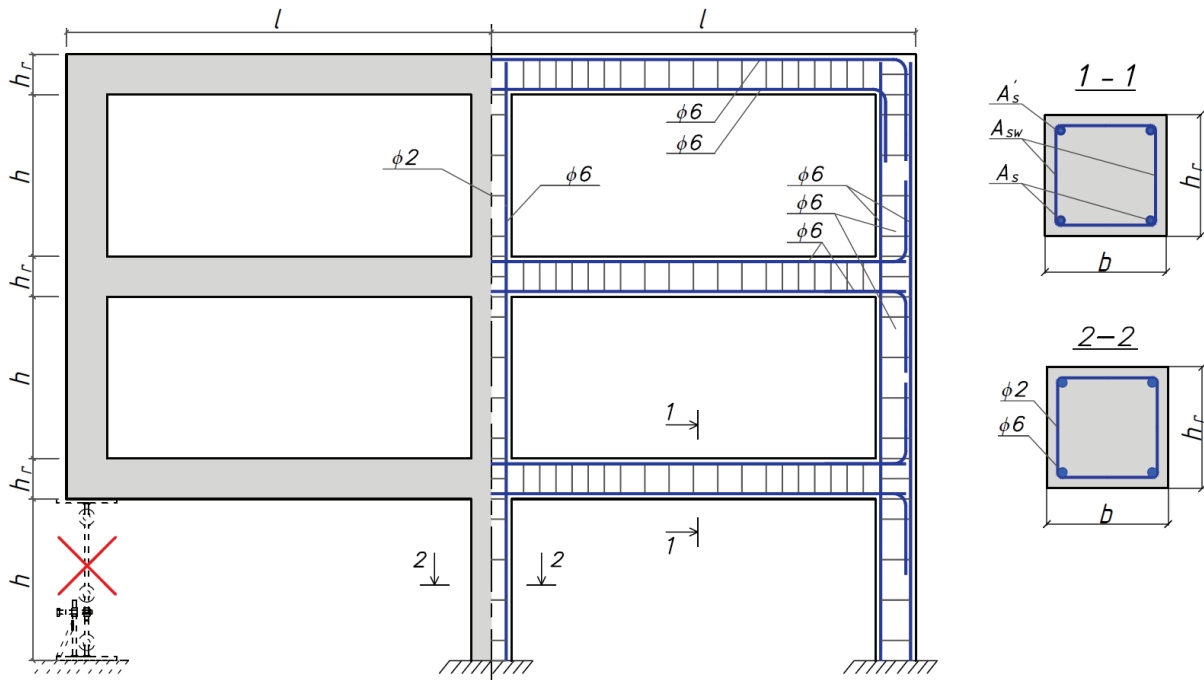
Scheme of formwork and reinforcement of a reinforced concrete frame
